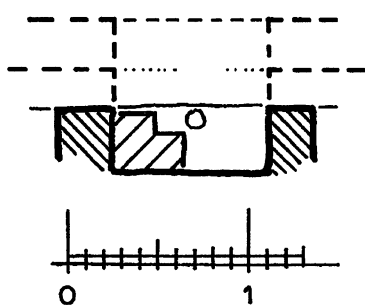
Section of the bathtub in the building with the cruciform pillars
